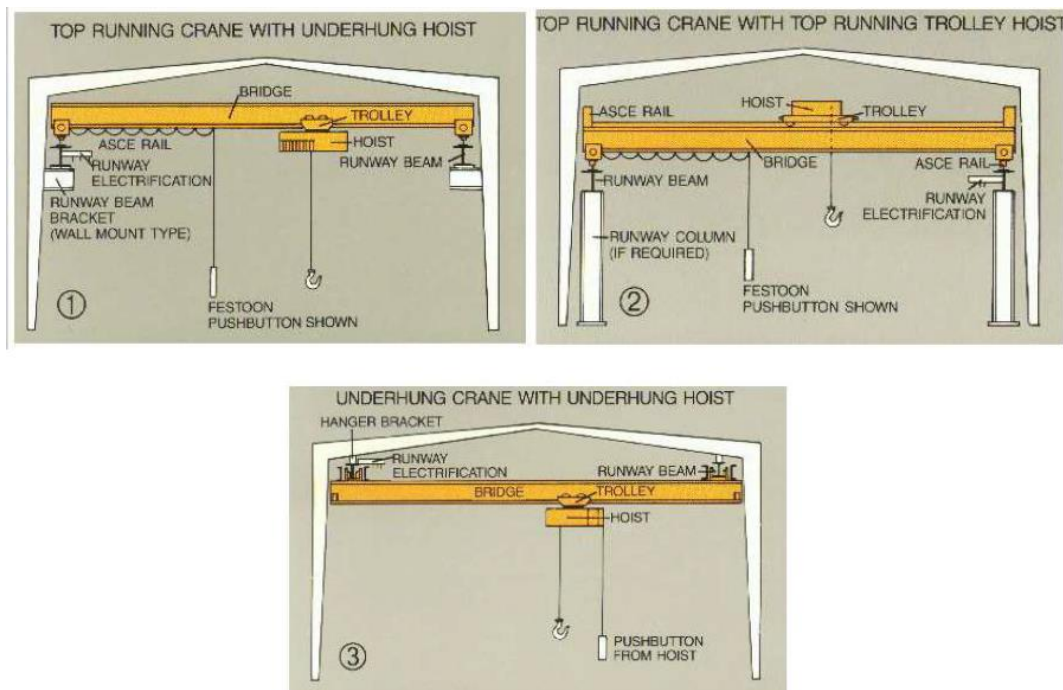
Crane with a hoist (<https://www.munckcranes.com/crane-component-guide>)
